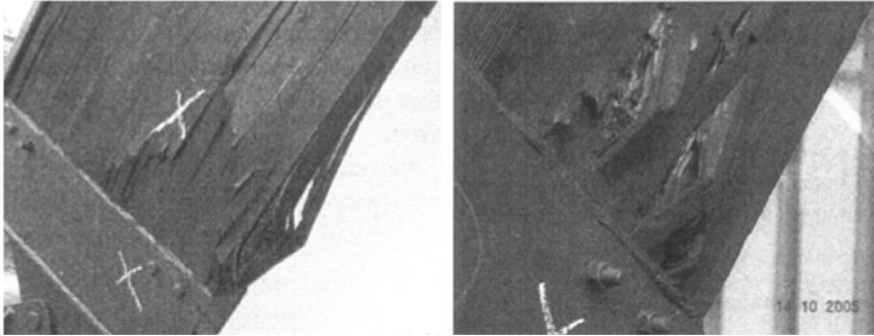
Delamination of the fibres of arches' supporting zones [24]
